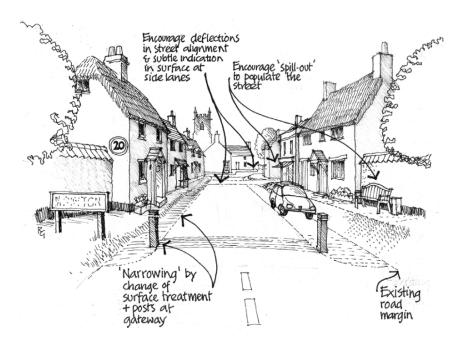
Excerpt from Traffic in Villages exemplifying gateway village improvements
